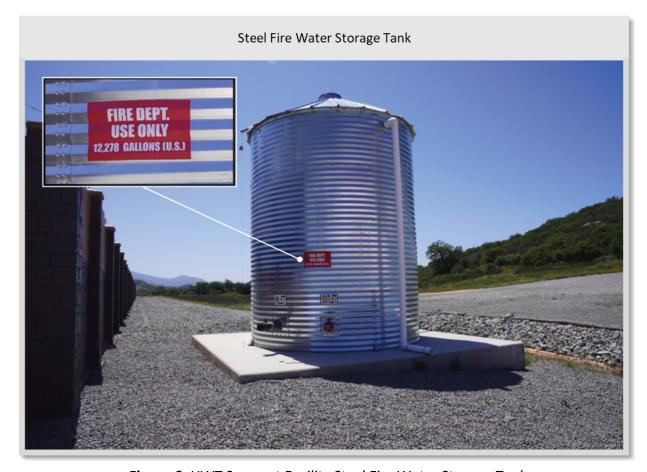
HWT Suncrest Facility Steel Fire Water Storage Tank
